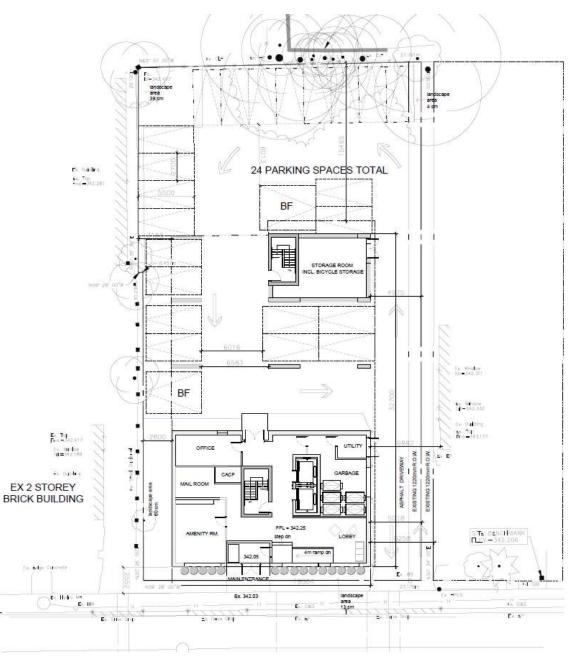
Proposed Site Plan. (Source: +VH Architects, The Ventin Group Ltd., 2021)
